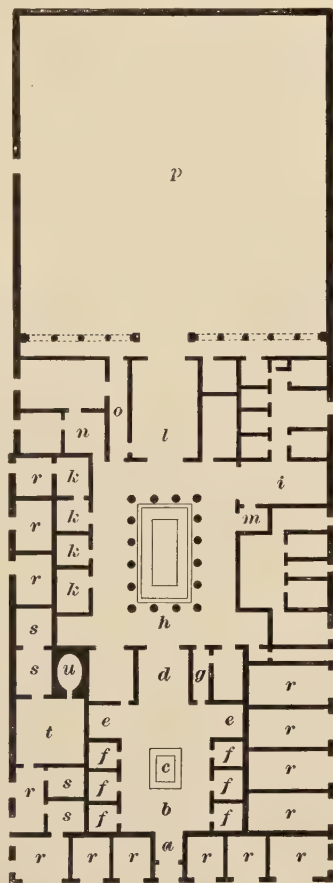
PLAN OF THE HOUSE OF PANSA, POMPEII
